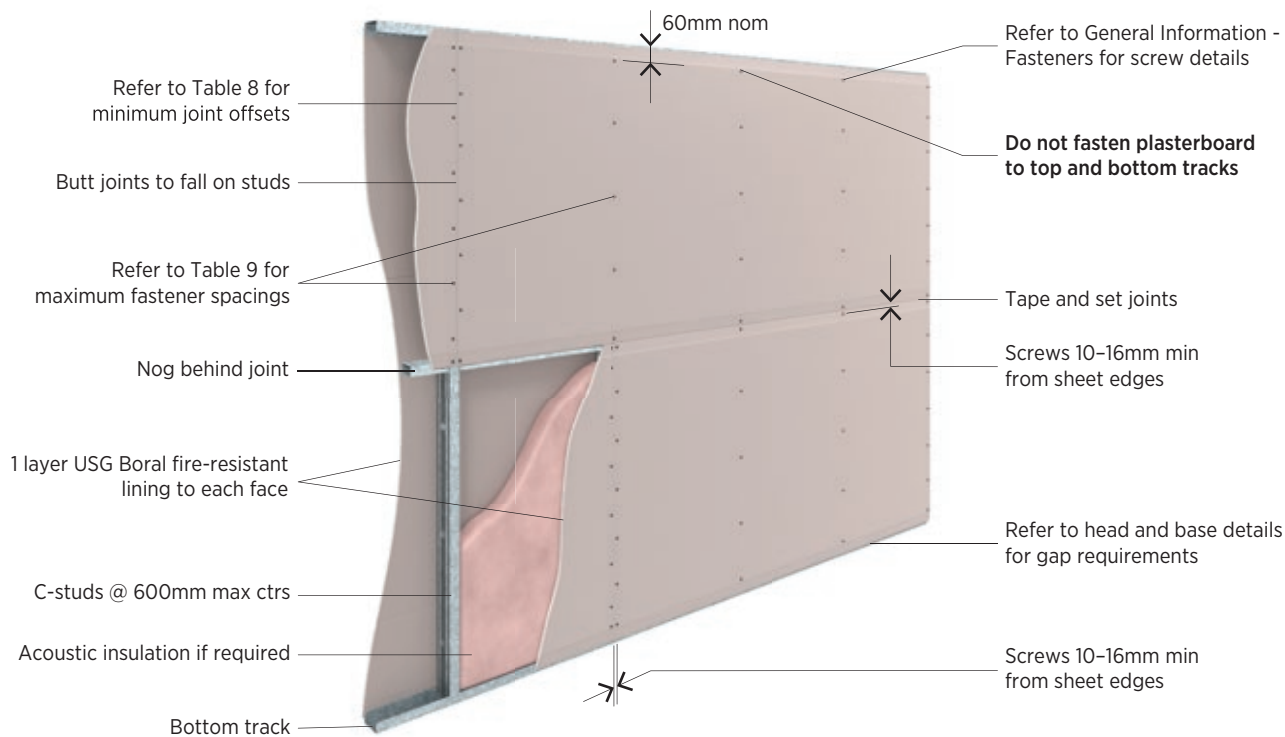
Fire-rated Steel Stud – Horizontal Fixing – Single Layer
